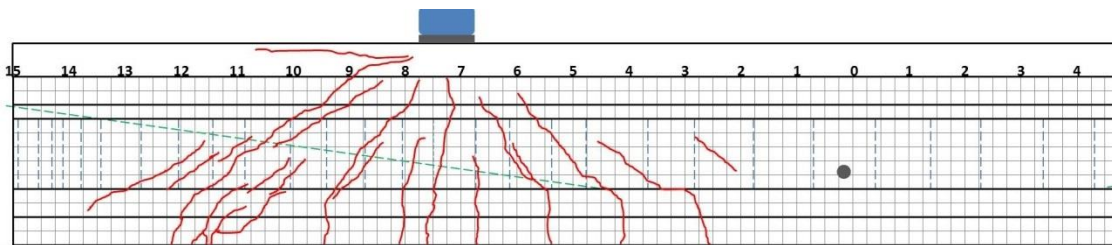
Shear test A1 cracking pattern (3 in. grid shown)
